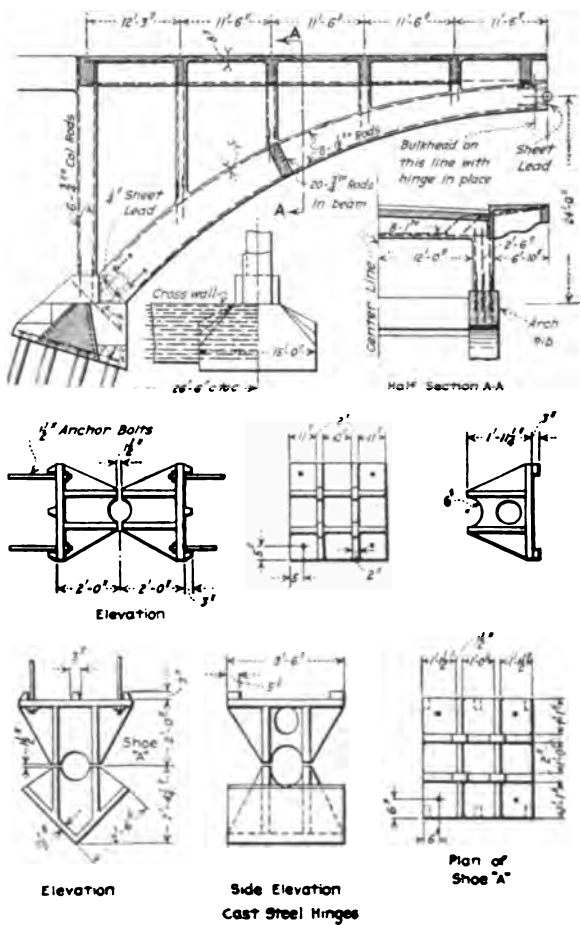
Details of Fourth Street bridge, Paducah, Ky.
